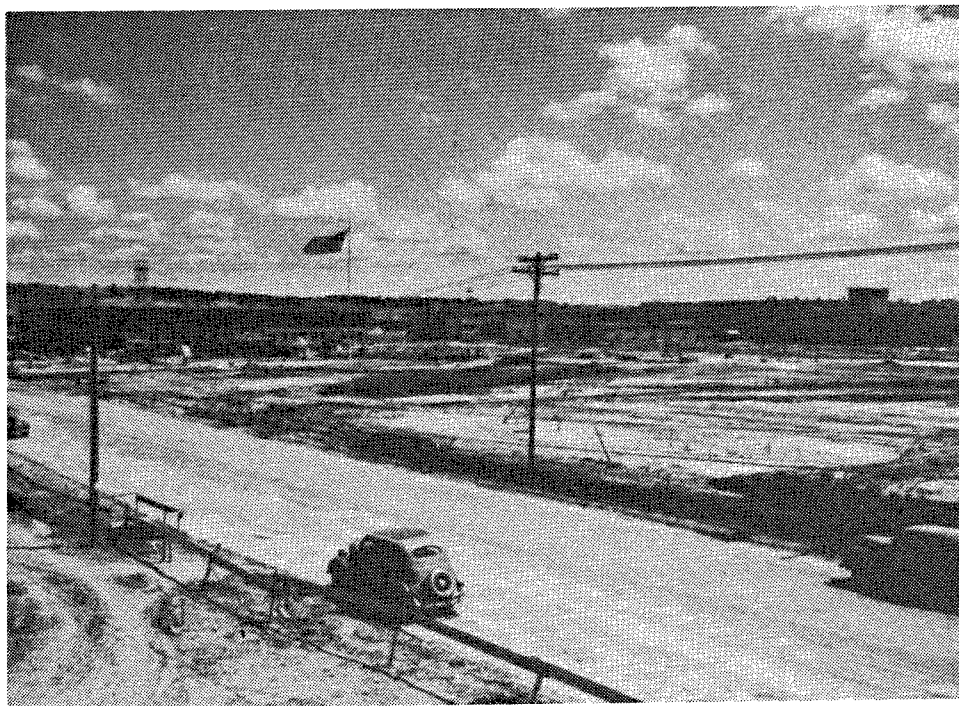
Overview of LCOP Administration building construction, 1941, view SW (original photograph on file, LCAAP).
